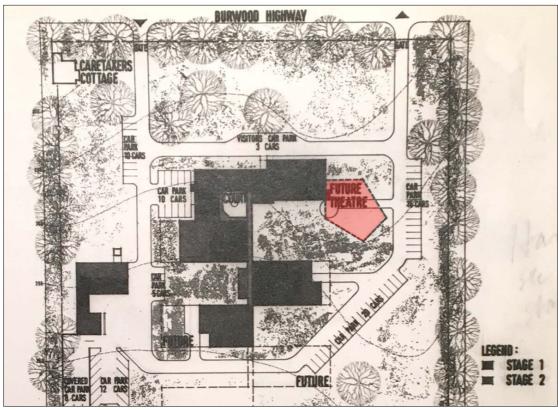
A 1970 site plan for the ARRB complex showing a future stages of development, including a theatre addition abutting the south-west corner of the Administration Building. Source: State Library of Victoria Manuscripts Collection.
